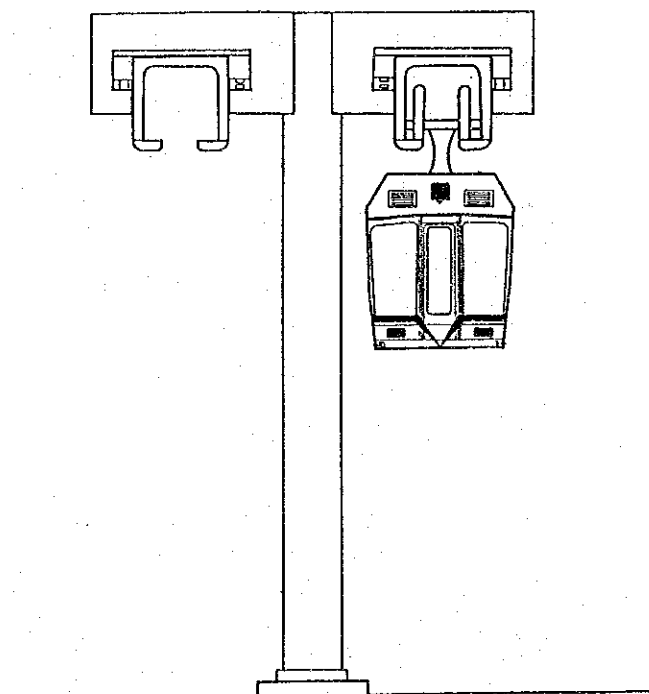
Cross Sectional Outline of Suspended Type Monorail
